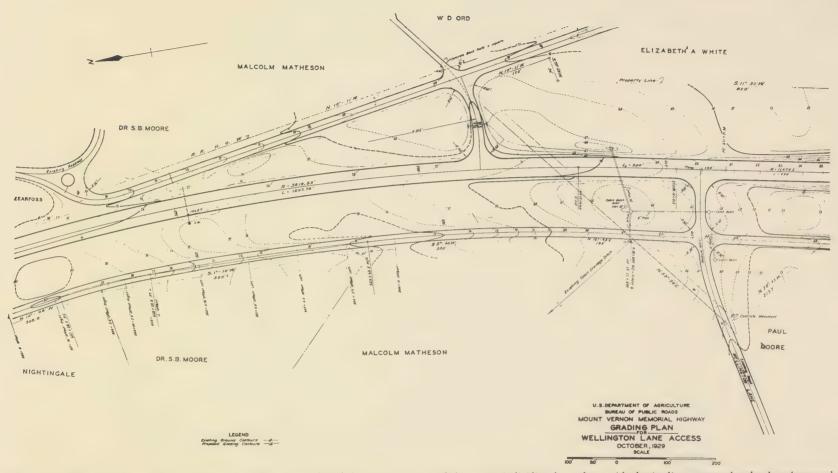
Where it has been necessary to provide crossings at grade and the curvature is too slight to permit dividing the roadway with pleasing lines, staggered outlets have been used Staggered outlets permit traffic to cross the traffic lanes on one-half of the highway and then flow with and weave across the traffic on the other half to an exit. The distance provided for the weaving of traffic across the half width of the pavement is approximately 400 feet, or the equivalent of a city block
